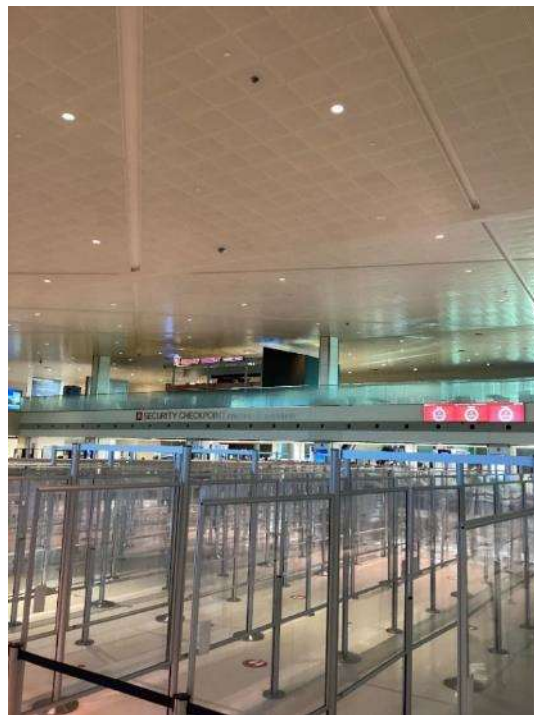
Typical Lighting and Air Distribution in Terminal Security Area
